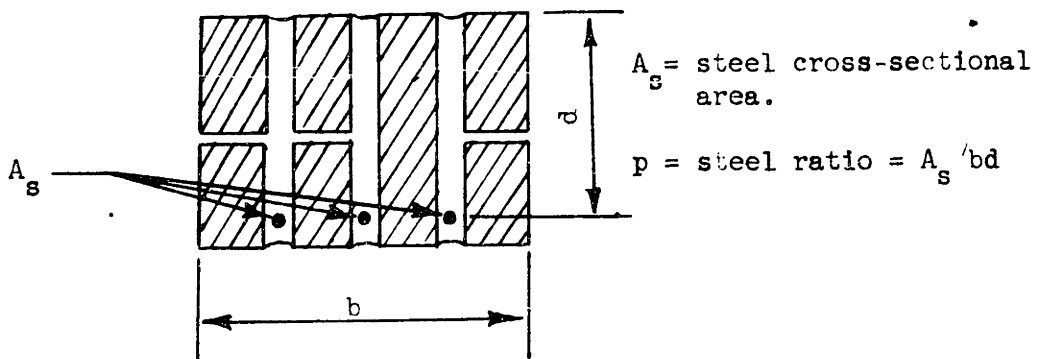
Cross-Sectional View of Typical Reinforced Masonry Section
